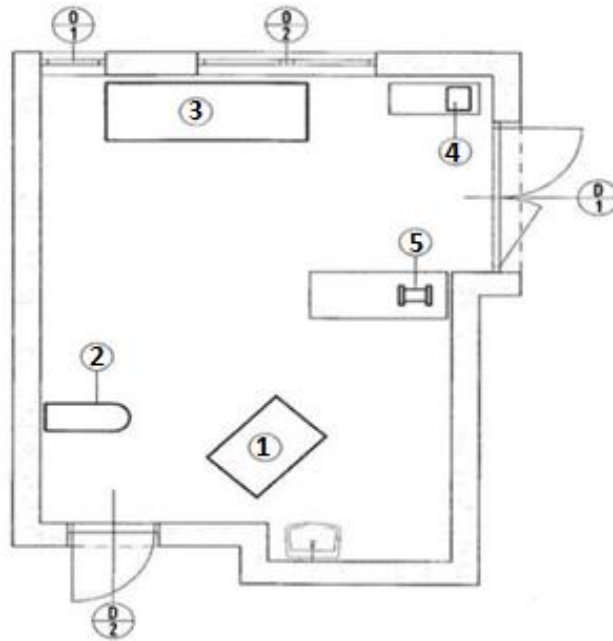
Project representation of the layout of the machines (VAS et al., 2005). 1 Vertical milling machine type FUS-22; 2 stand drill type FO-203; 3 lathe type C8C universal; 4 bench drill type FA-13; 5 grinder type designation TM2BR
